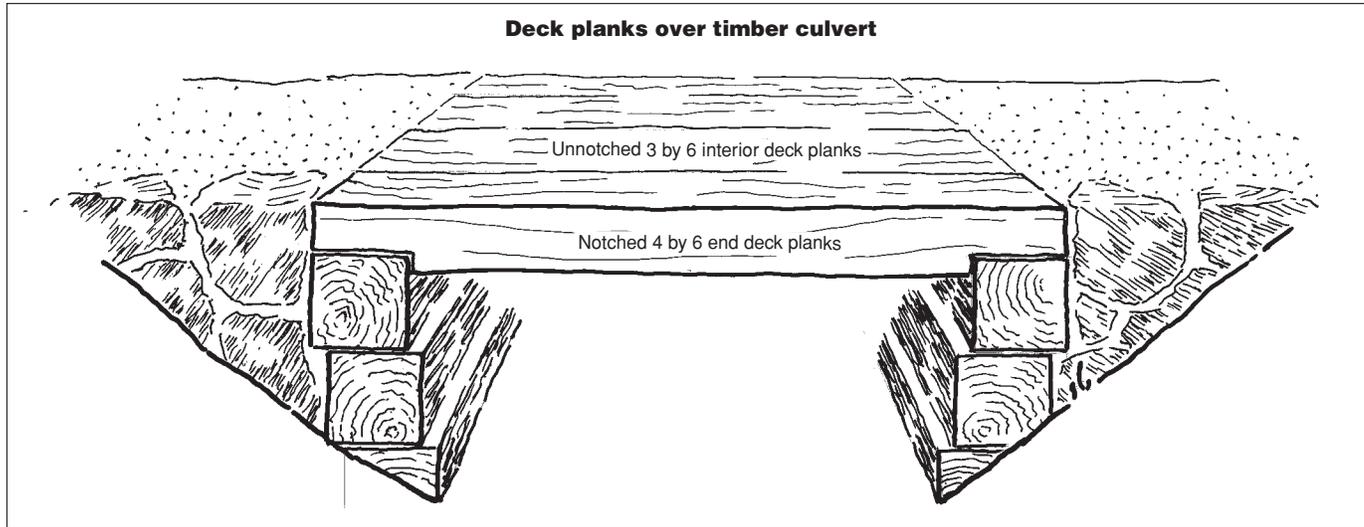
Notching the deck planks on both ends of the culvert (two planks with notches are adequate for a wall up to 24 inches high) helps to brace the walls.
